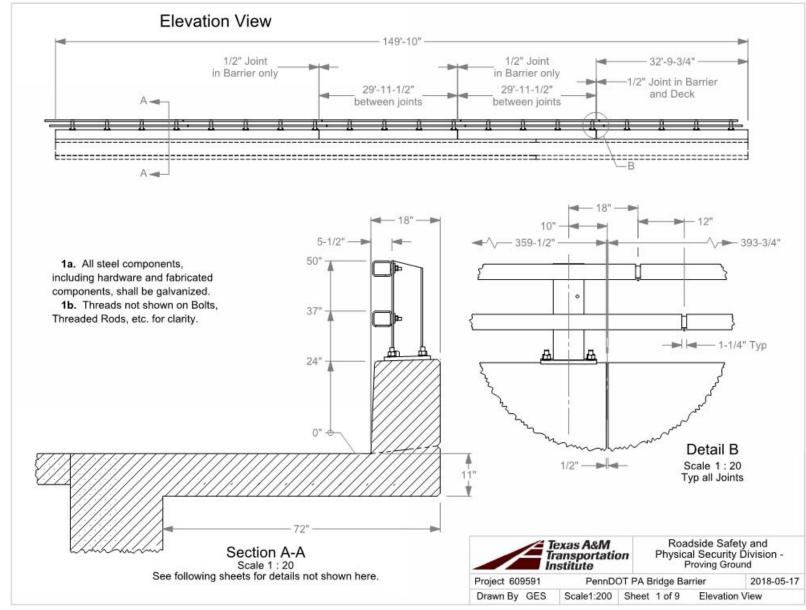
Details of the PennDOT PA Bridge Barrier.
